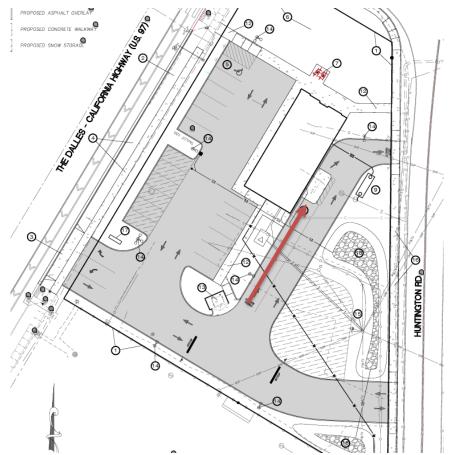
Applicant's site plan, red arrow indicates queuing area for the proposed drive-through
